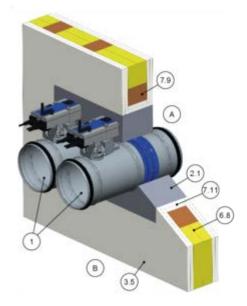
Mortar-based installation into a lightweight partition wall, half-timbered construction
